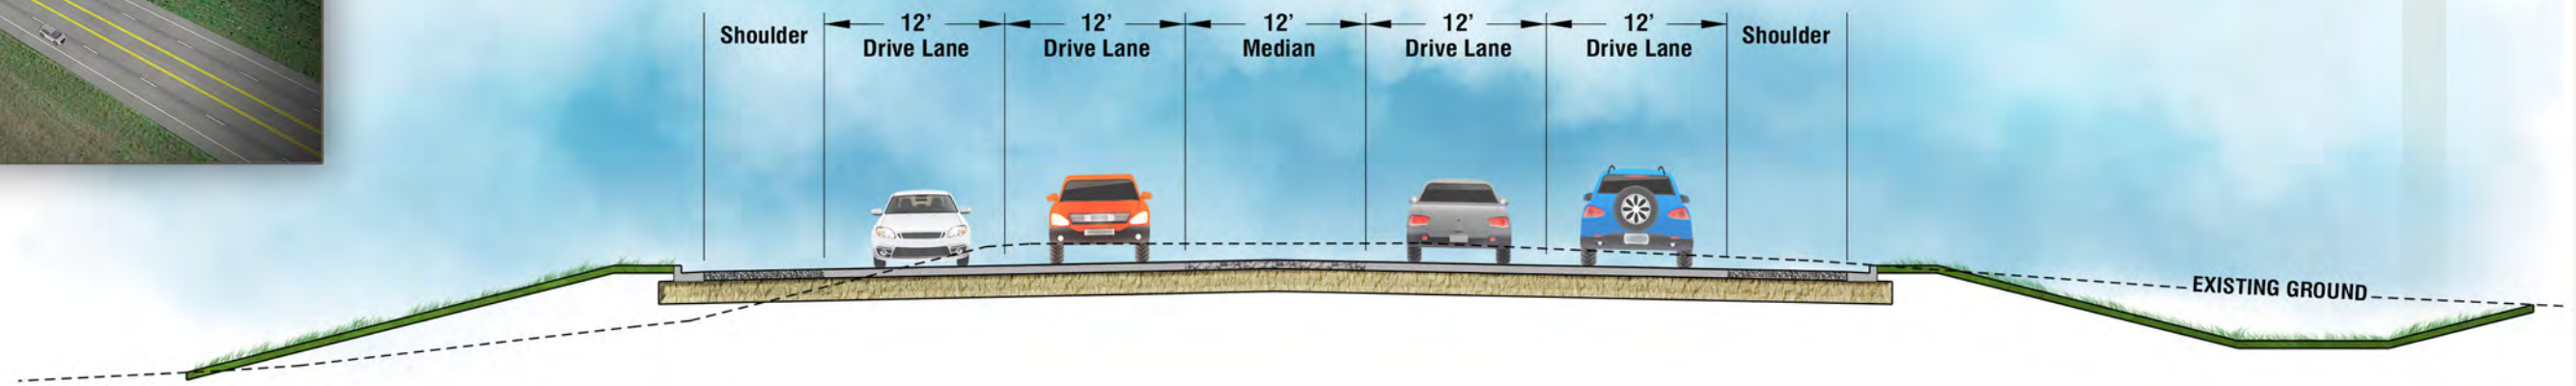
, Typical Section for Urbanized, Four-lane Section
